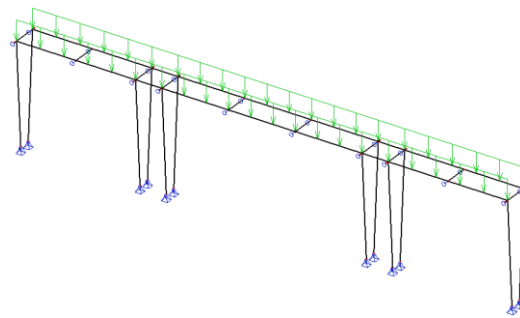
Computing model utilizing a slanting column at the internal span of the frame
